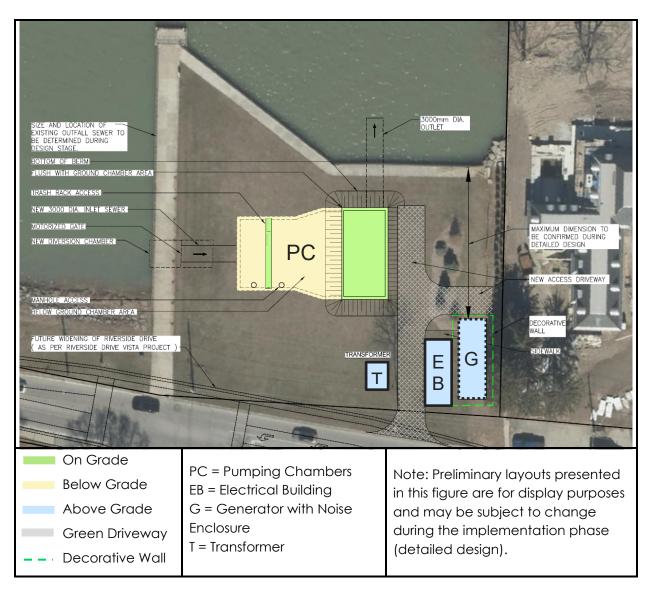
A: Recommended Site Layout Alternative No. 3B
